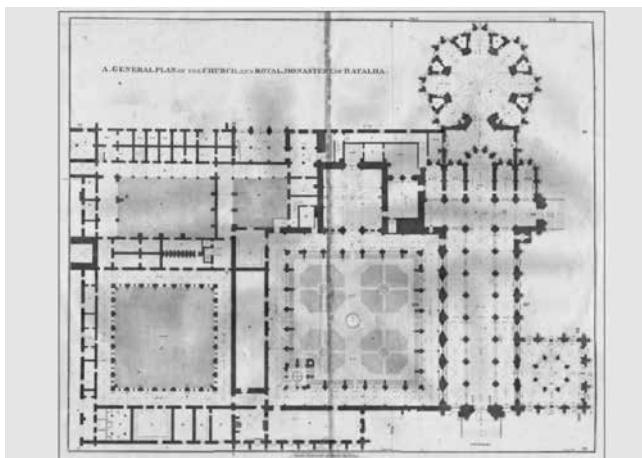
James Murphy. "A General Plan of the Church and Royal Monastery of Batalha". *Plans, Elevations, Sections and Views of the Church of Batalha*, London, 1792/1795.
